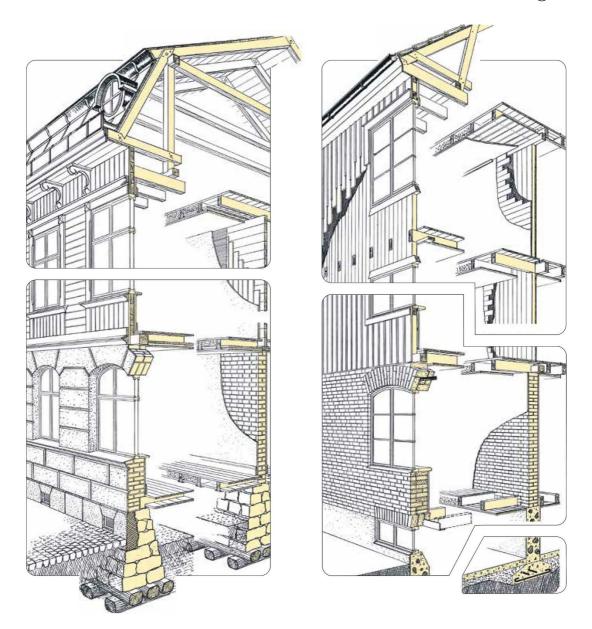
Structure of governor's houses. Ground floors are in brick and two upper floors in wood. The earliest houses had horizontal planks, the later ones vertical, often prefabricated, one floor high (not illustrated here). The planks were covered with boards on the outside and plastered on the inside. [From Björk, Cecilia, Per Kallstenius and Laila Reppen. *Så byggdes husen 1880–2020*, 45 and 47.]
